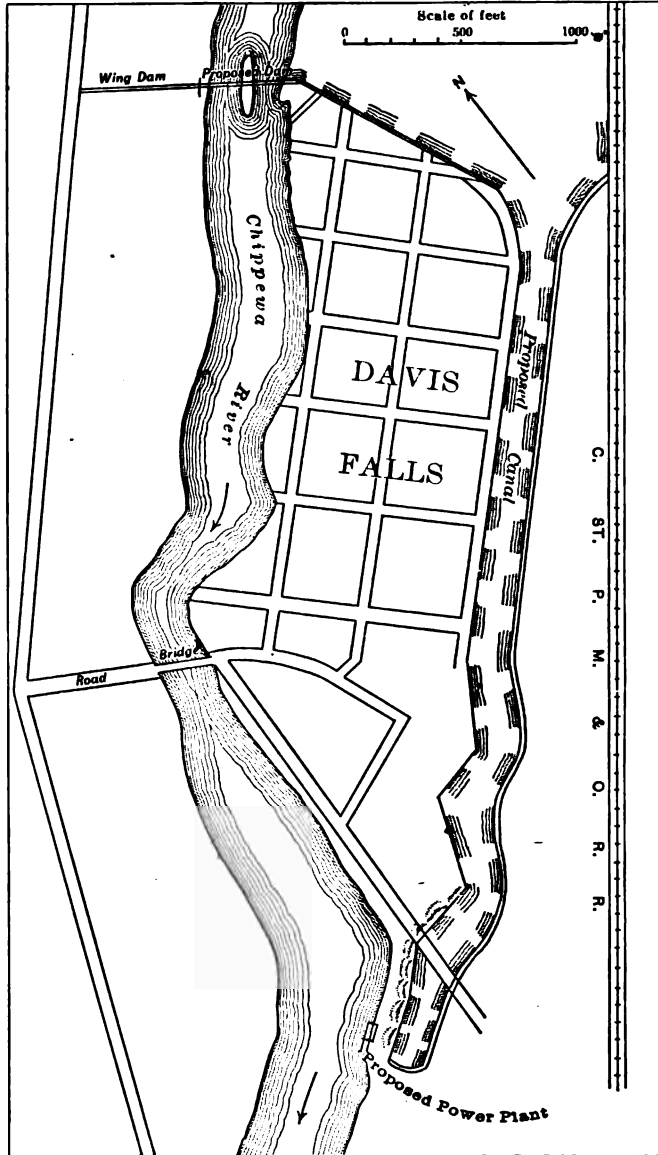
Plan of proposed water-power development at Jim Falls (Davis Falls).
